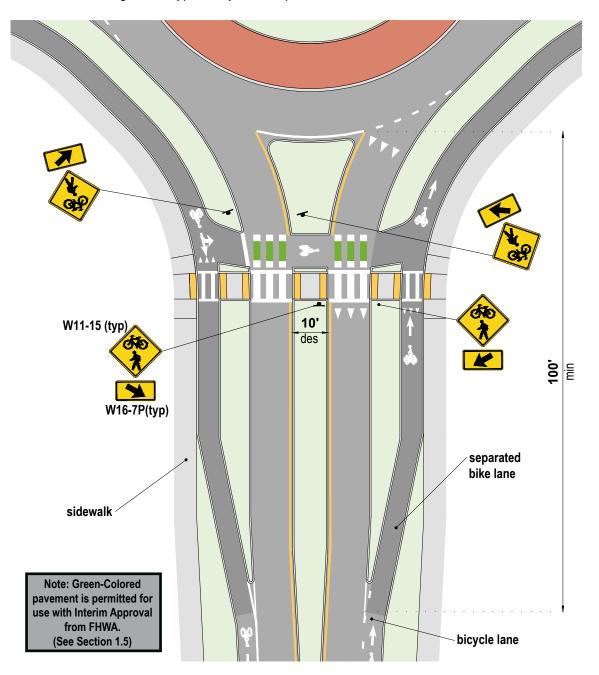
Typical Layout of Separated Bike Lanes at Roundabout
